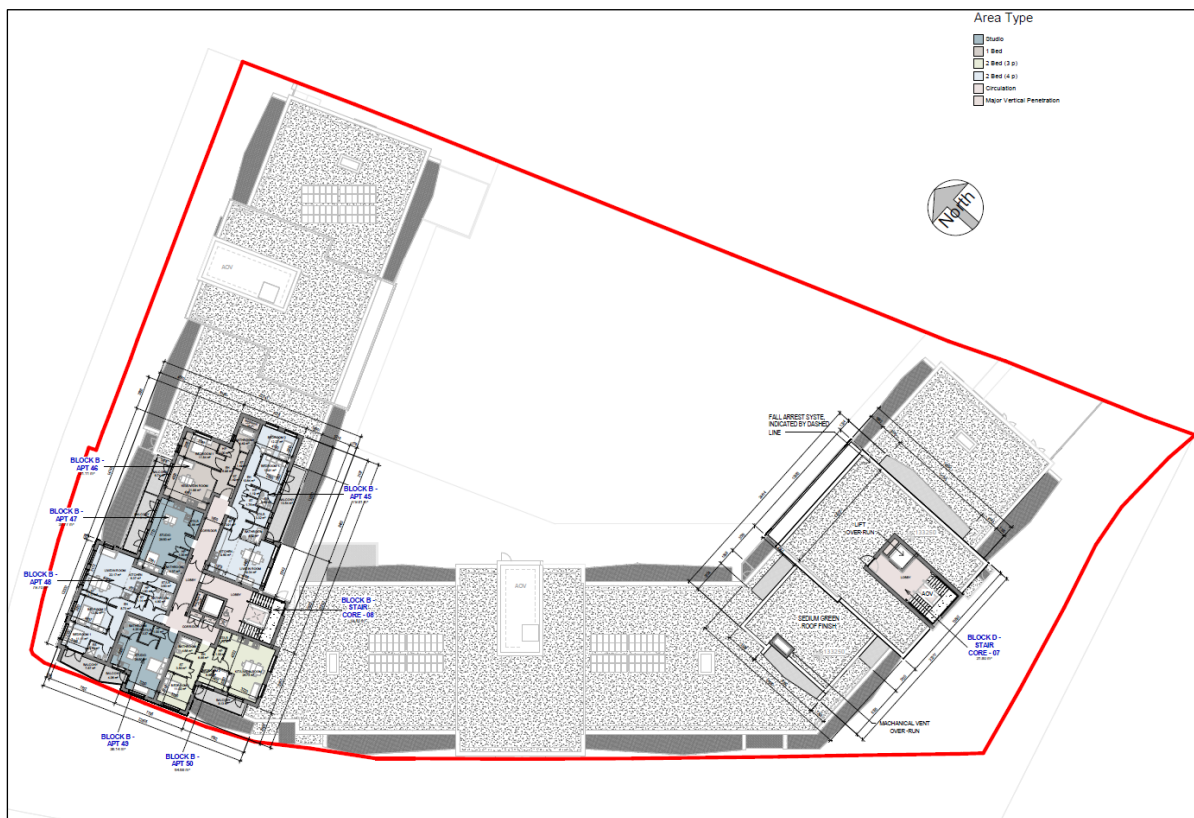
Eighth floor plan of development approved under ABP Ref. No. 303803-19
